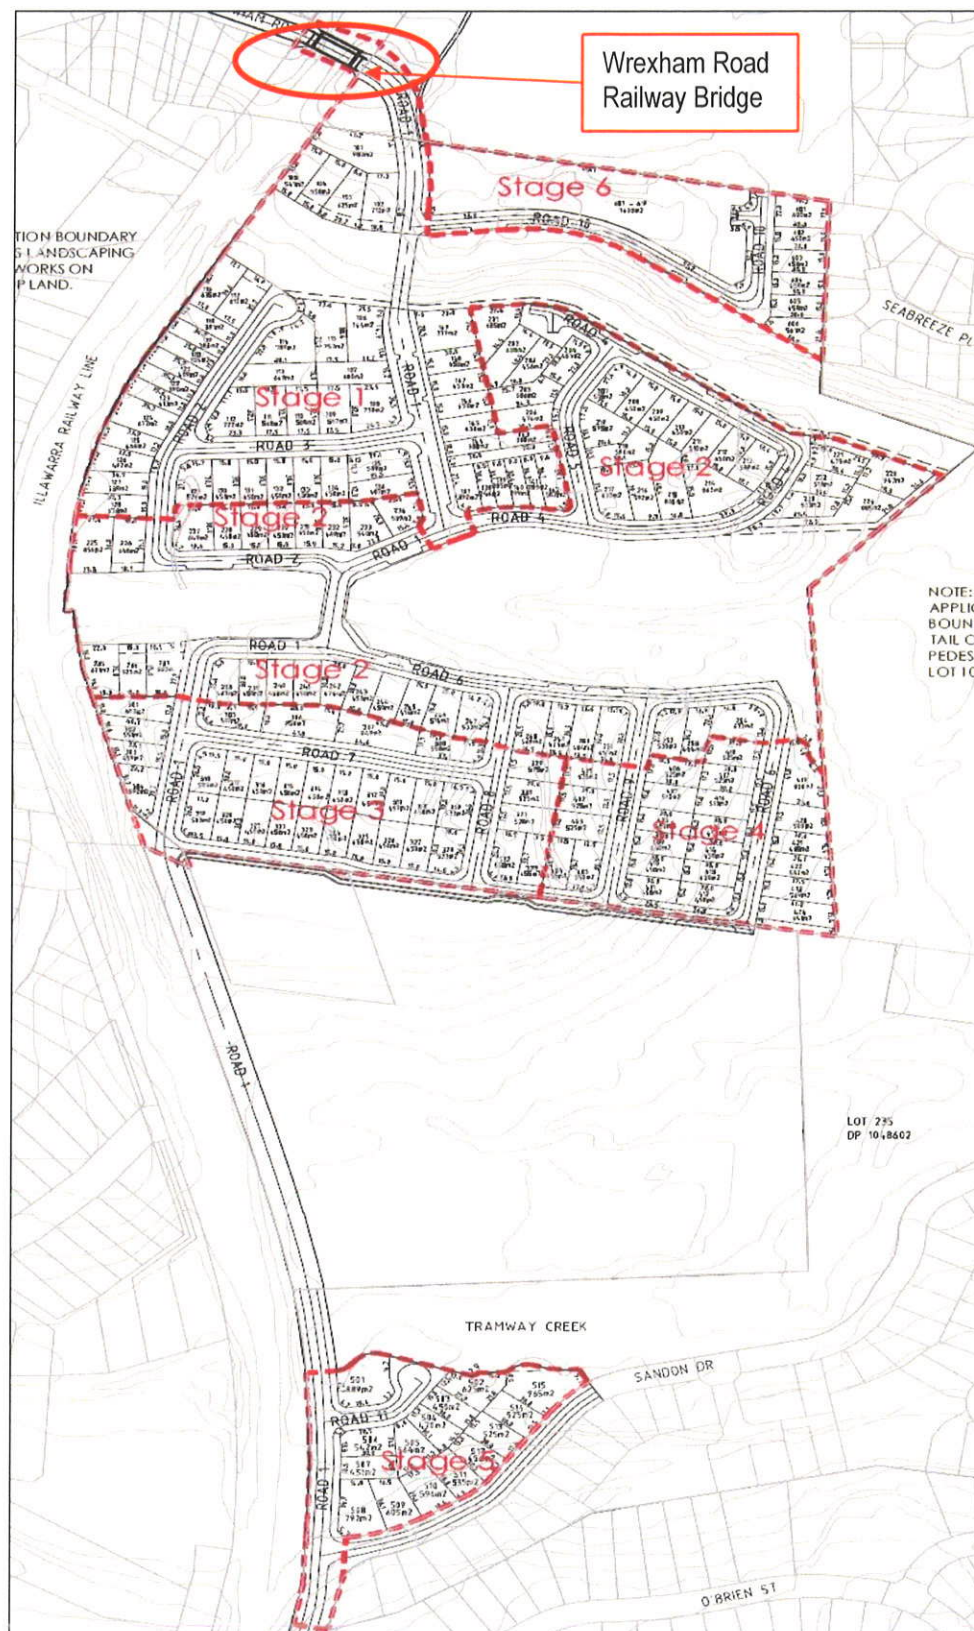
Subdivision Plan – Wrexham Road Rail Bridge.
